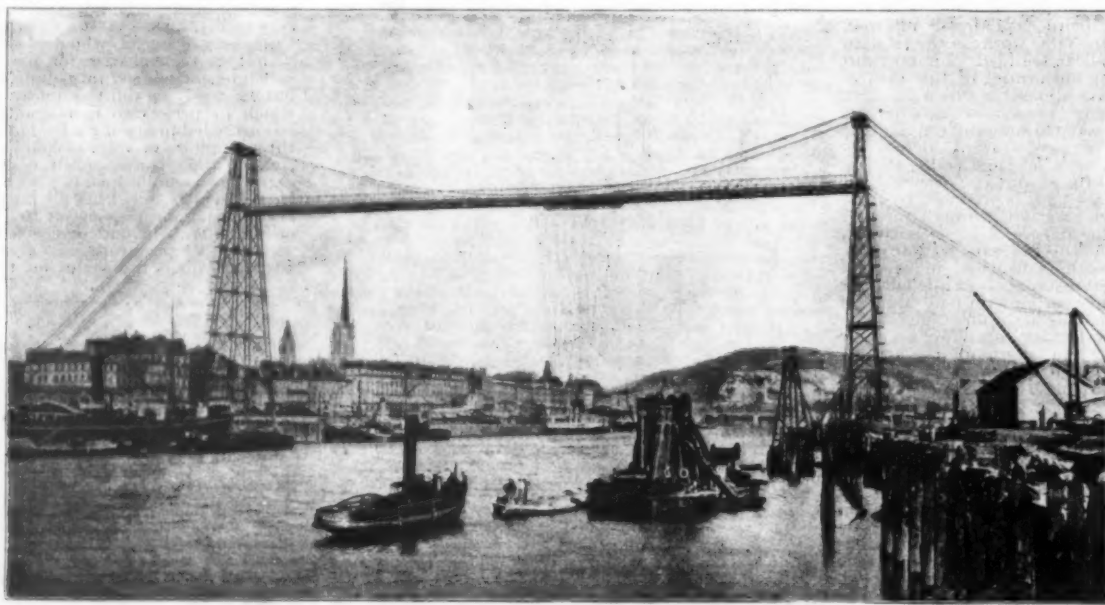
GENERAL VIEW OF THE NEW BRIDGE AT ROUEN.
